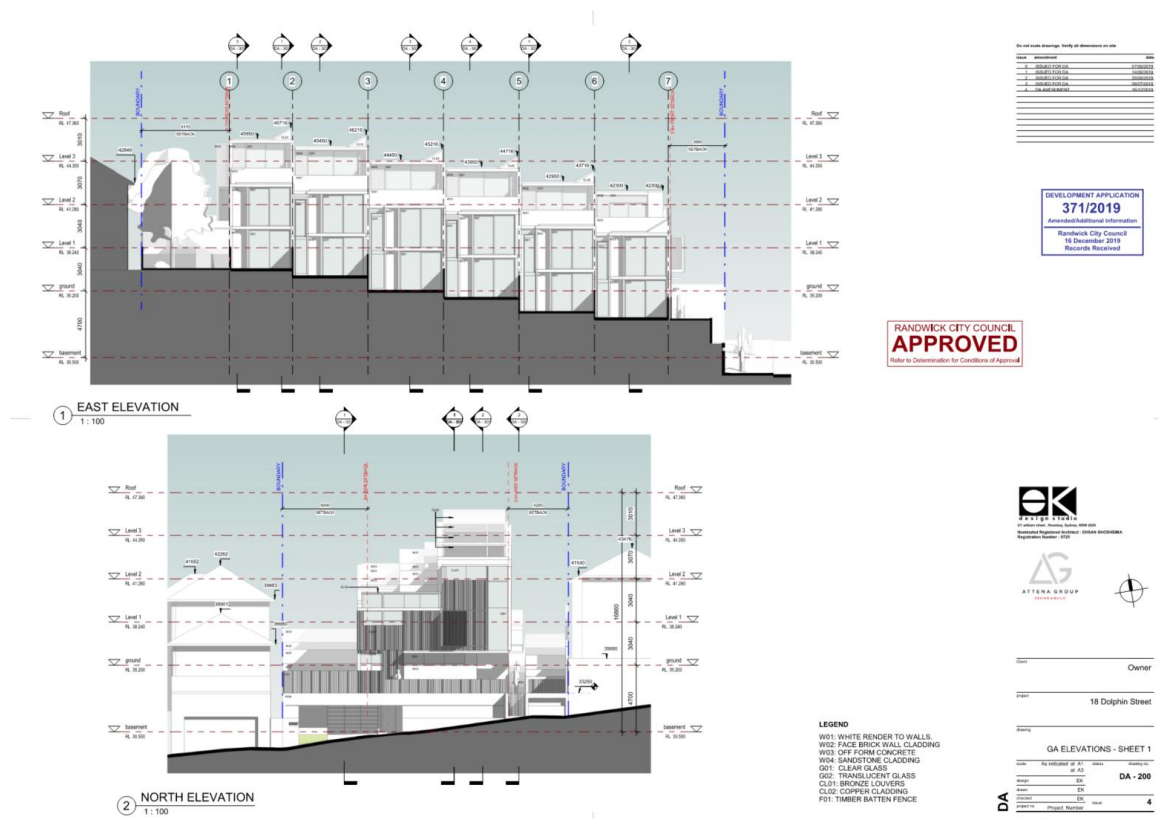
North & East Elevations approved under DA/371/2019 (Source: EK Design Studio)
